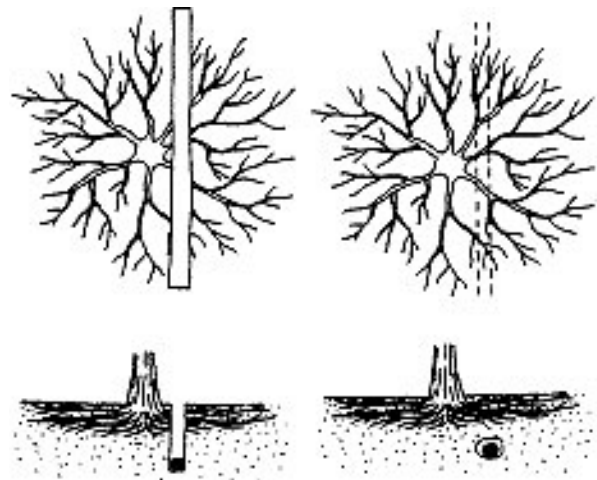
Trenching vs. Tunneling. Trenching near a tree (left) can kill almost half its roots. A tunnel or boring (right) in the same place will do virtually no damage to the tree. Source: Missouri Extension
